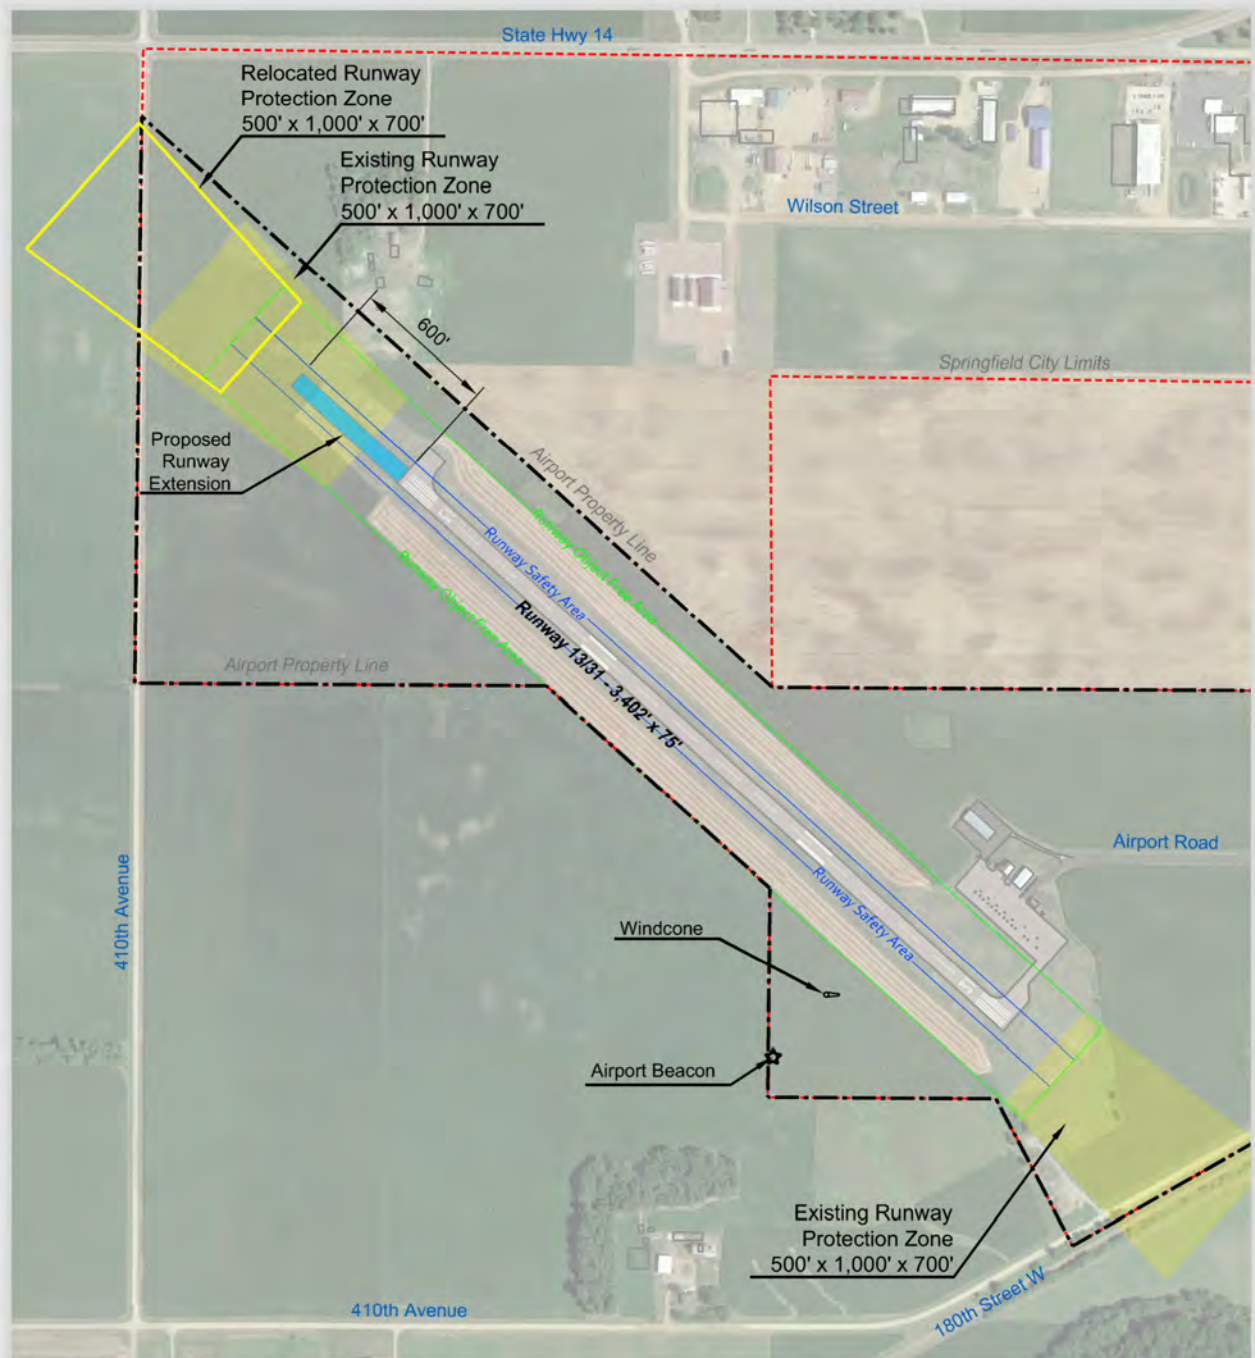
Runway Alternative 2: 600 Foot Extension
